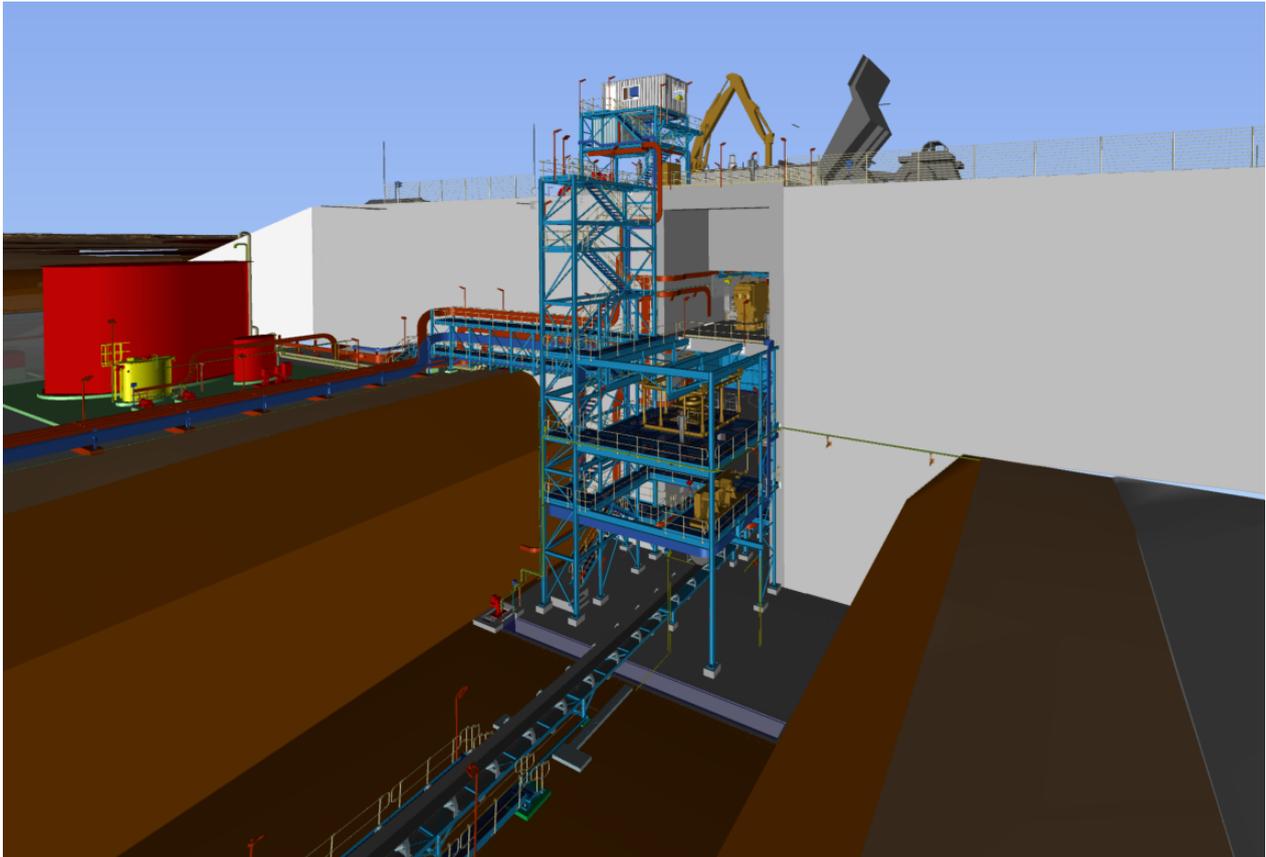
Dry plant detailed design drawings: Primary crusher installation.
